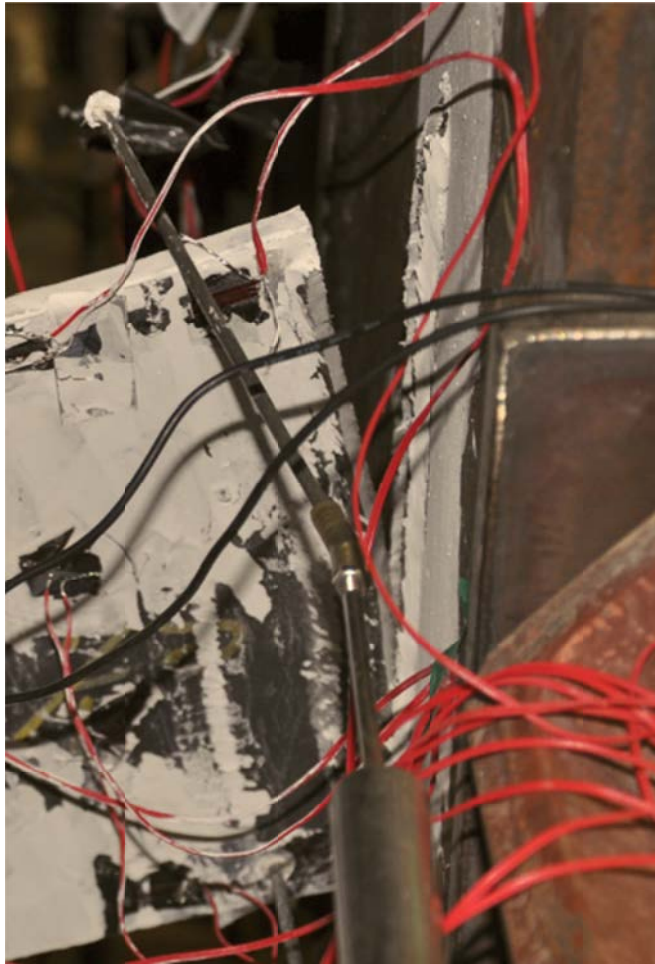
Weld Tearing at End of Test, Configuration 3
